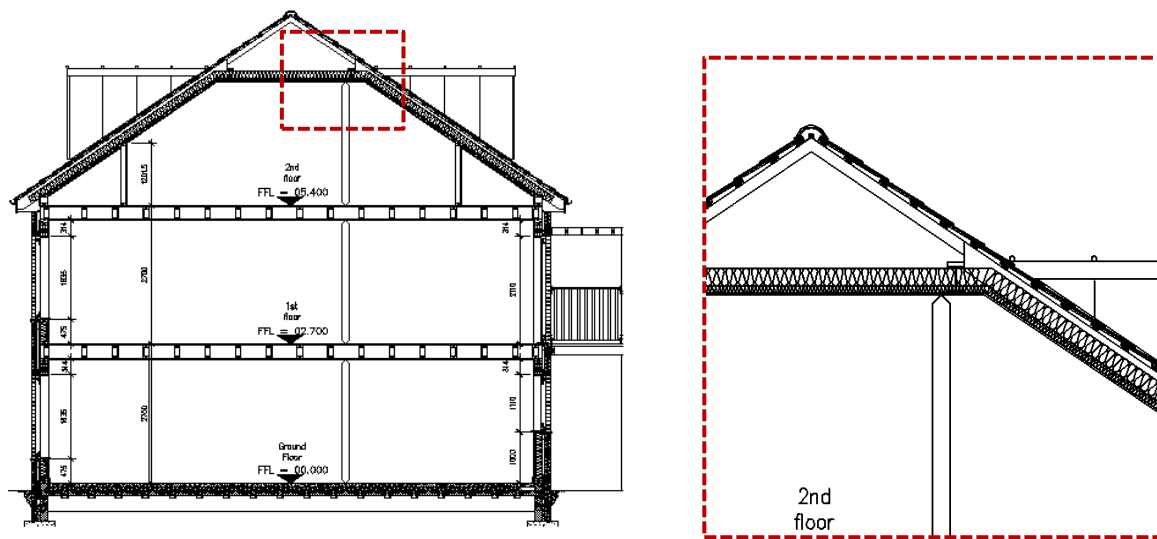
Section and roof detail showing that the top of the steel beam in the roof structure is not insulated creating the thermal bridge shown in Figure 11.
